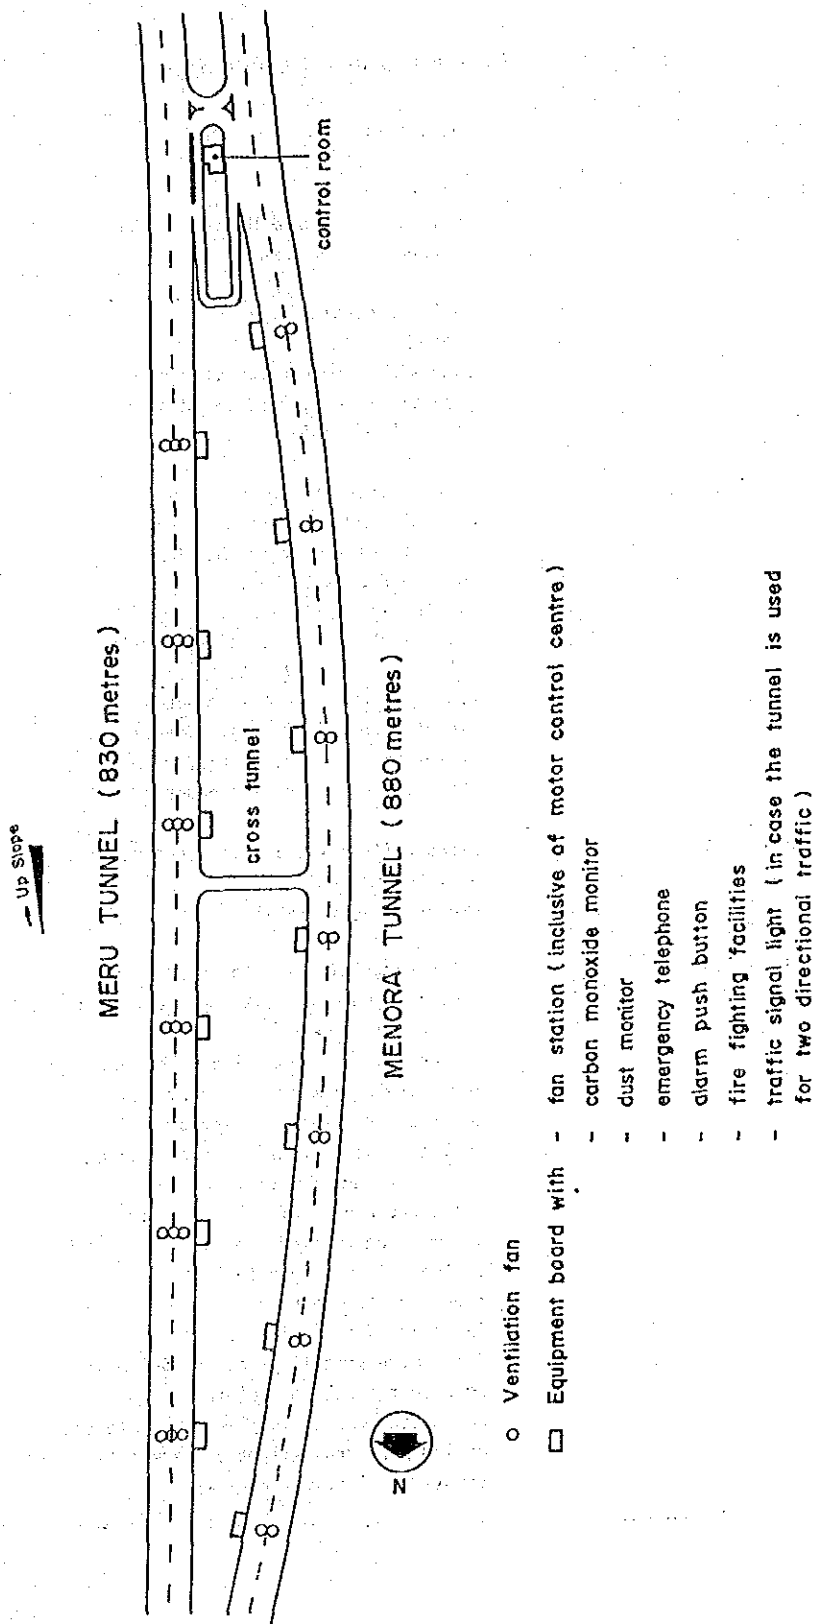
Layout of Equipment in Meru-Menora Tunnel
